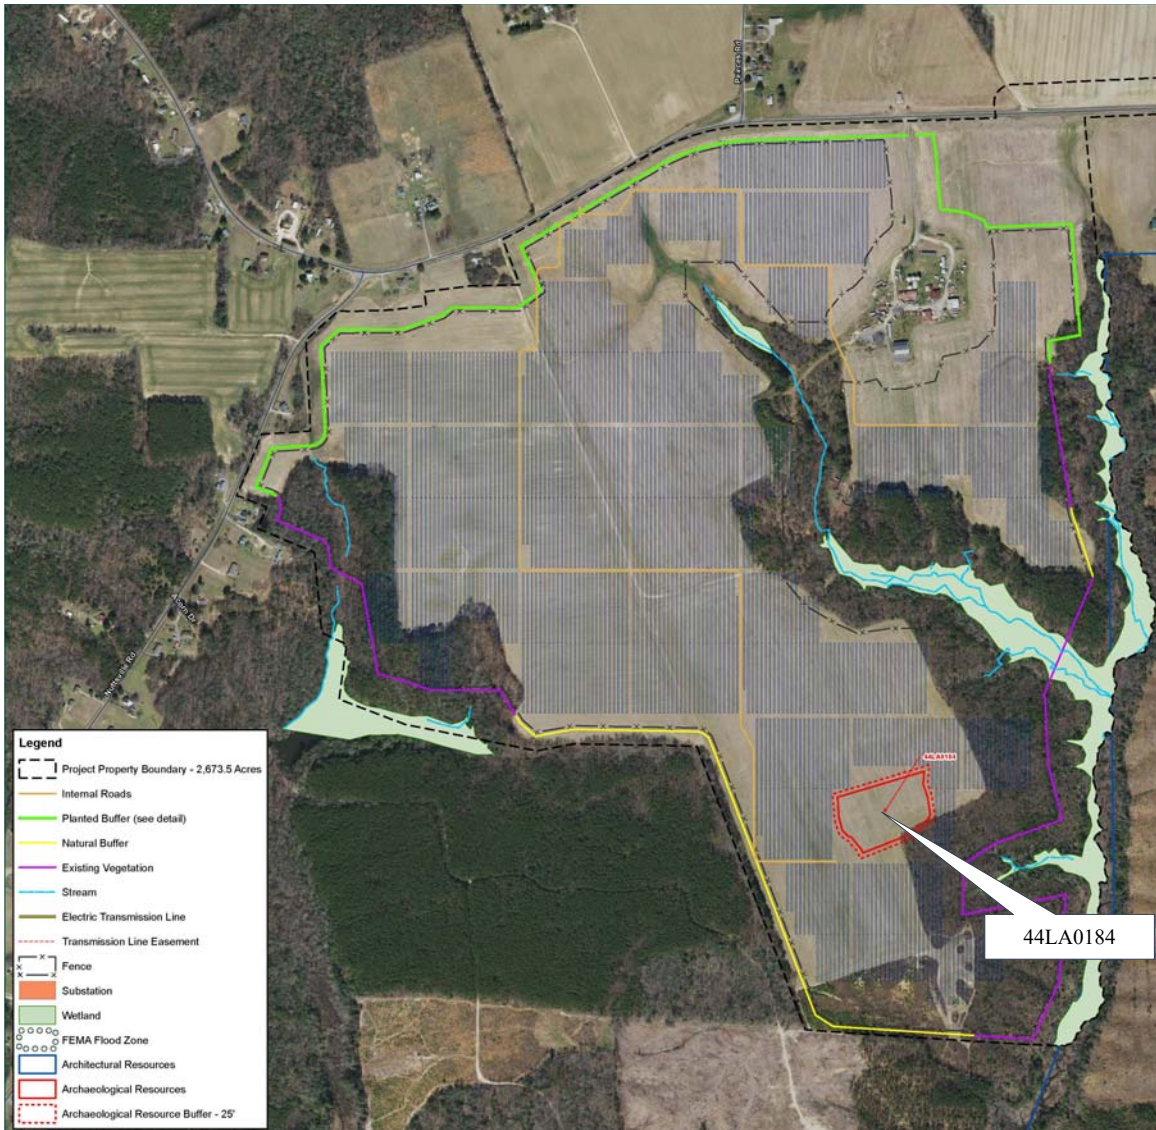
Waller Solar Project conceptual site plan, showing planned avoidance of Site 44LA0184.
